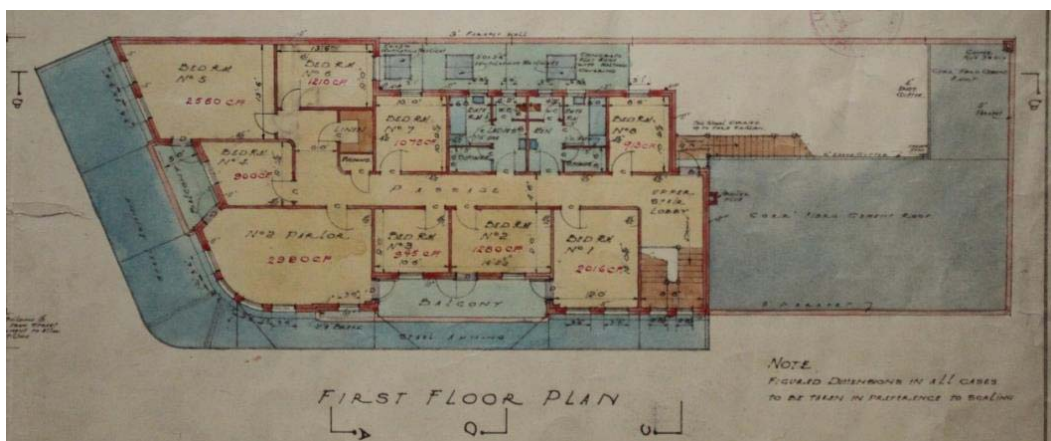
Extract from Building Application Plans comprising first floor plan, 1939. (Source: City of Sydney Archives, BA 266/39)
